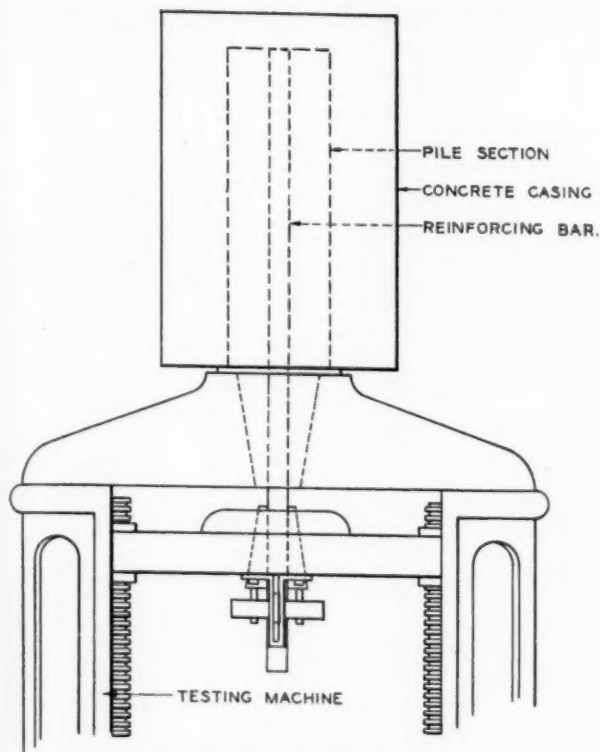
APPARATUS USED IN ANCHORAGE TESTS
